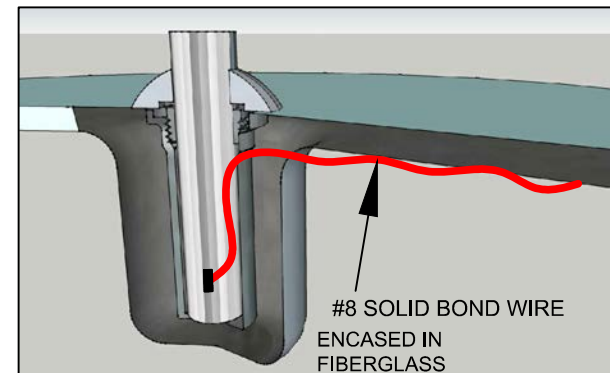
DETAIL REFLECTS ANCHOR INSTALLATION IN NESPA SHELLS ONLY.
